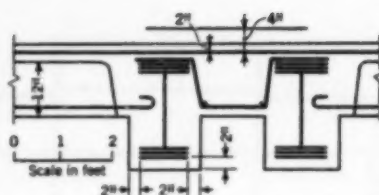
Section shows position of negative steel in concrete joists as they cross double steel beam. Concrete framing in east-west direction saves floor depth at intersections such as this.
